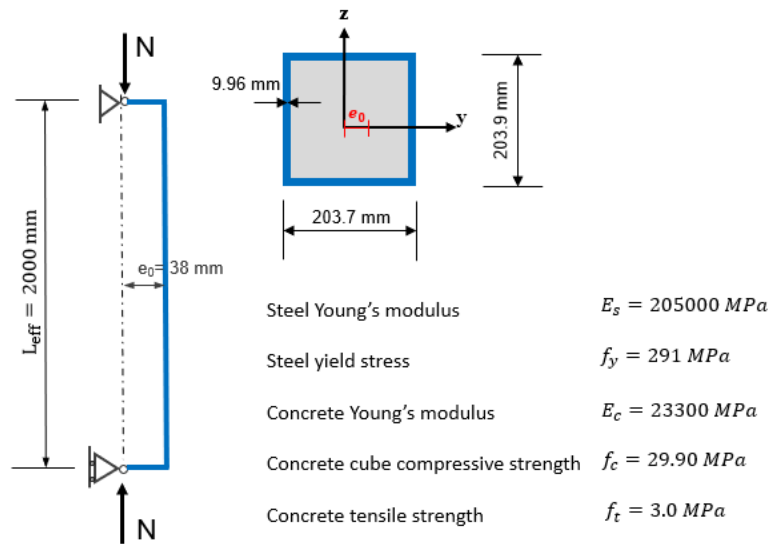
Concrete fillet steel box (CFSB) tested by Bridge (1976) (adopted from [75])
